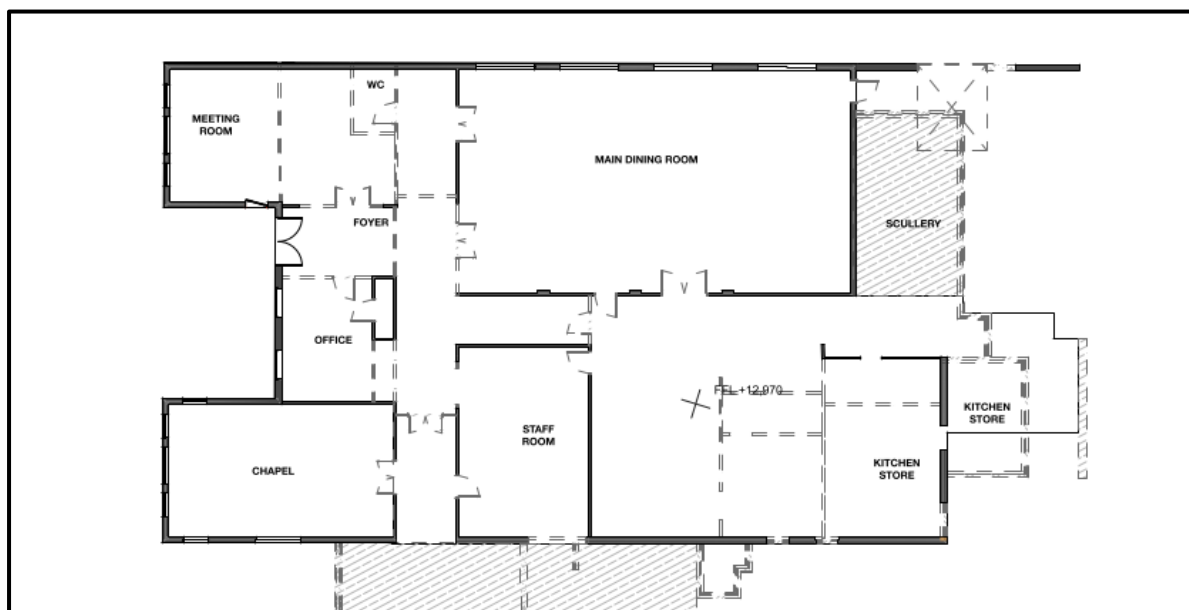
Proposed B1 Demolition Plan for Subject Modification C
